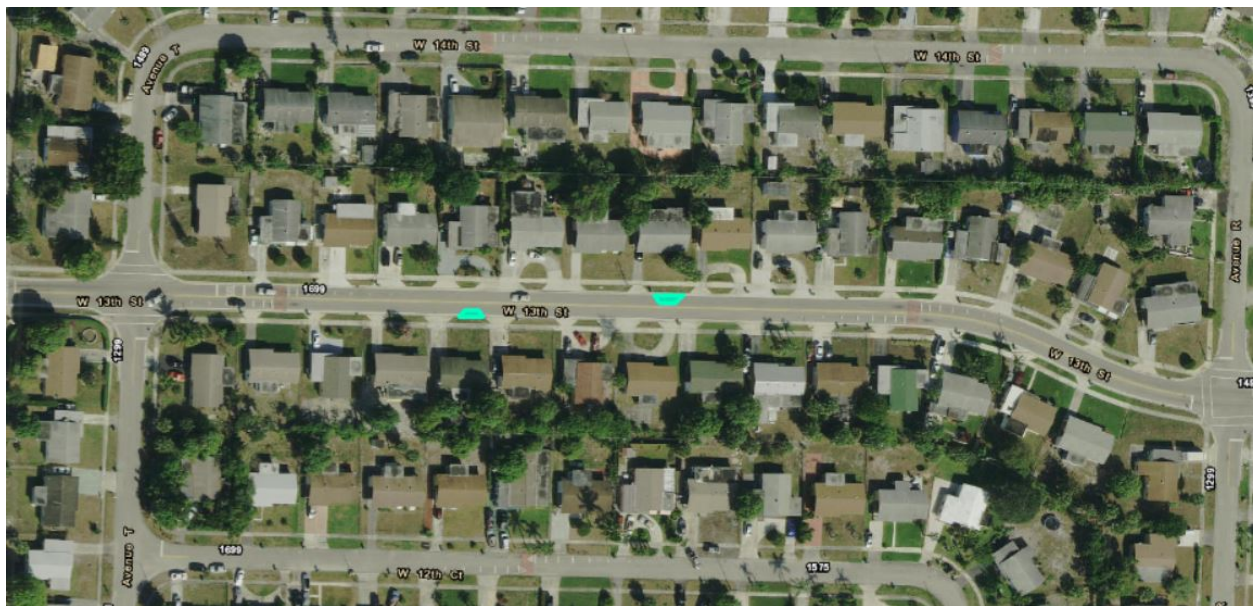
b: Proposed Design Alternative 5: Chicanes
